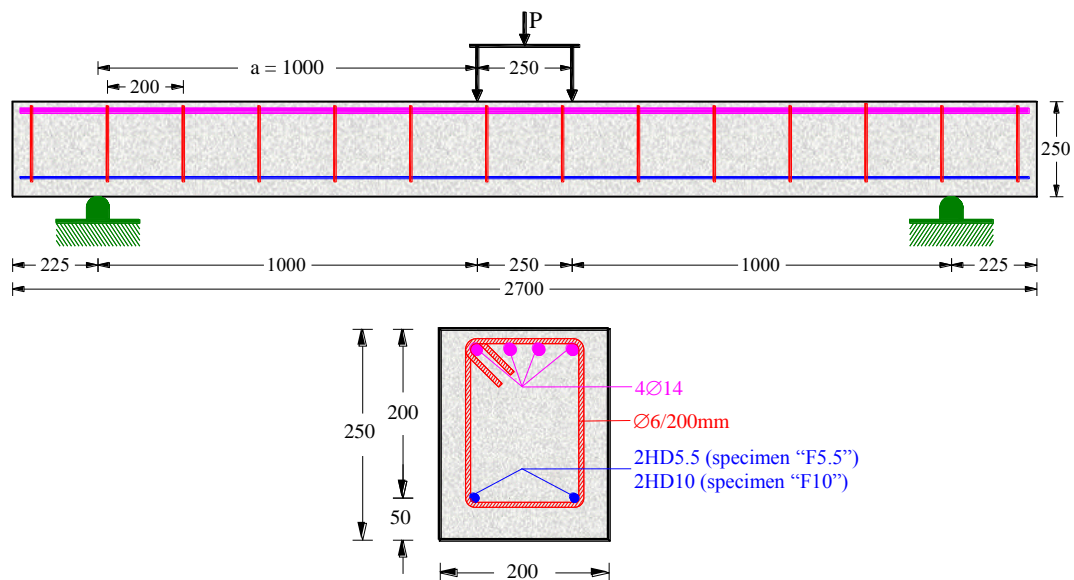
Geometry and reinforcement details of the tested beams (dimensions in mm)
